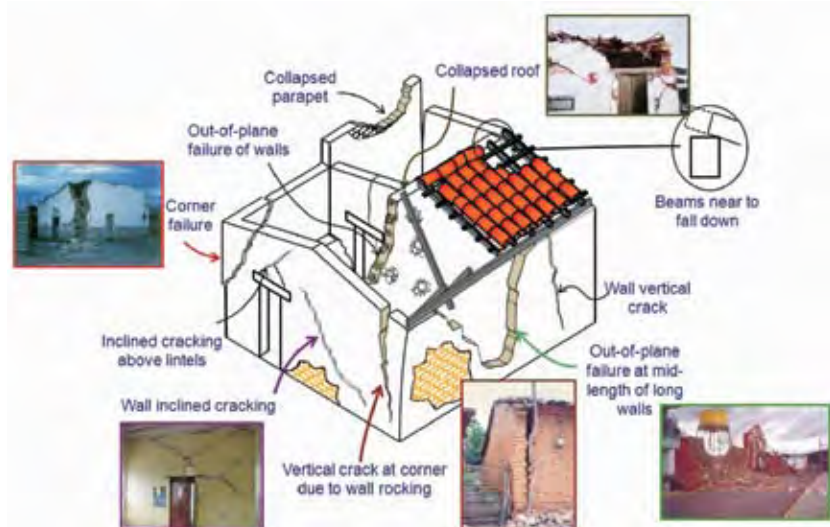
Typical damage pattern in masonry construction due to seismic event
